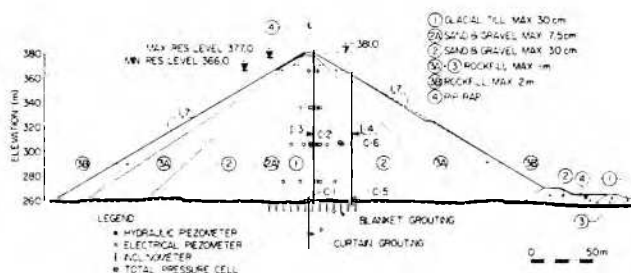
Typical Section and Location of Instruments in Main River Valley
